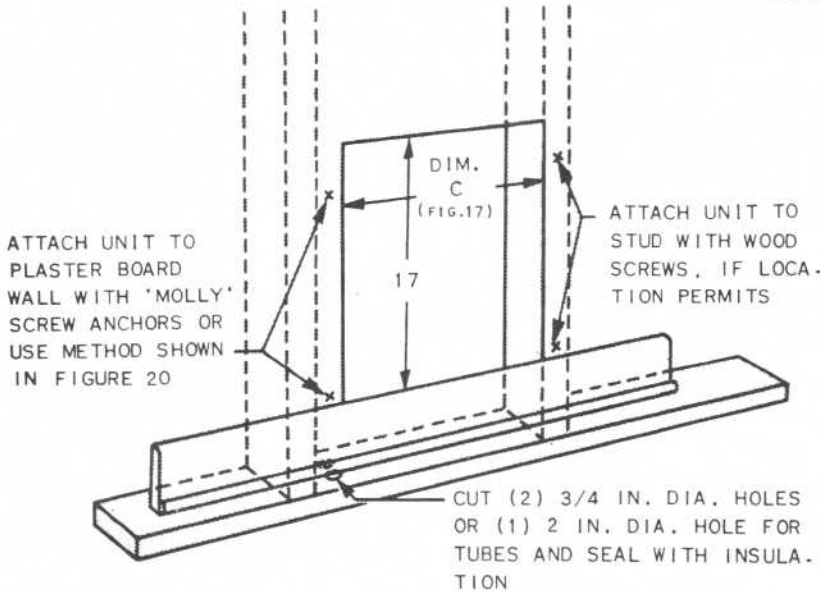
Details for Mounting Unit in Wall on Old Construction
